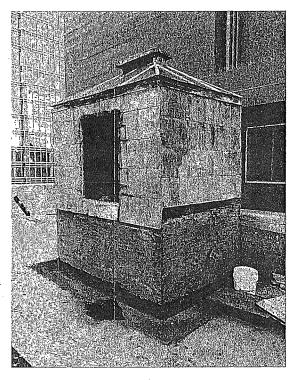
Photograph of elevator penthouse clad in metal panels over wood sheathing. Note surface corrosion on metal panels and missing access door (photograph taken on 02/27/2018)
